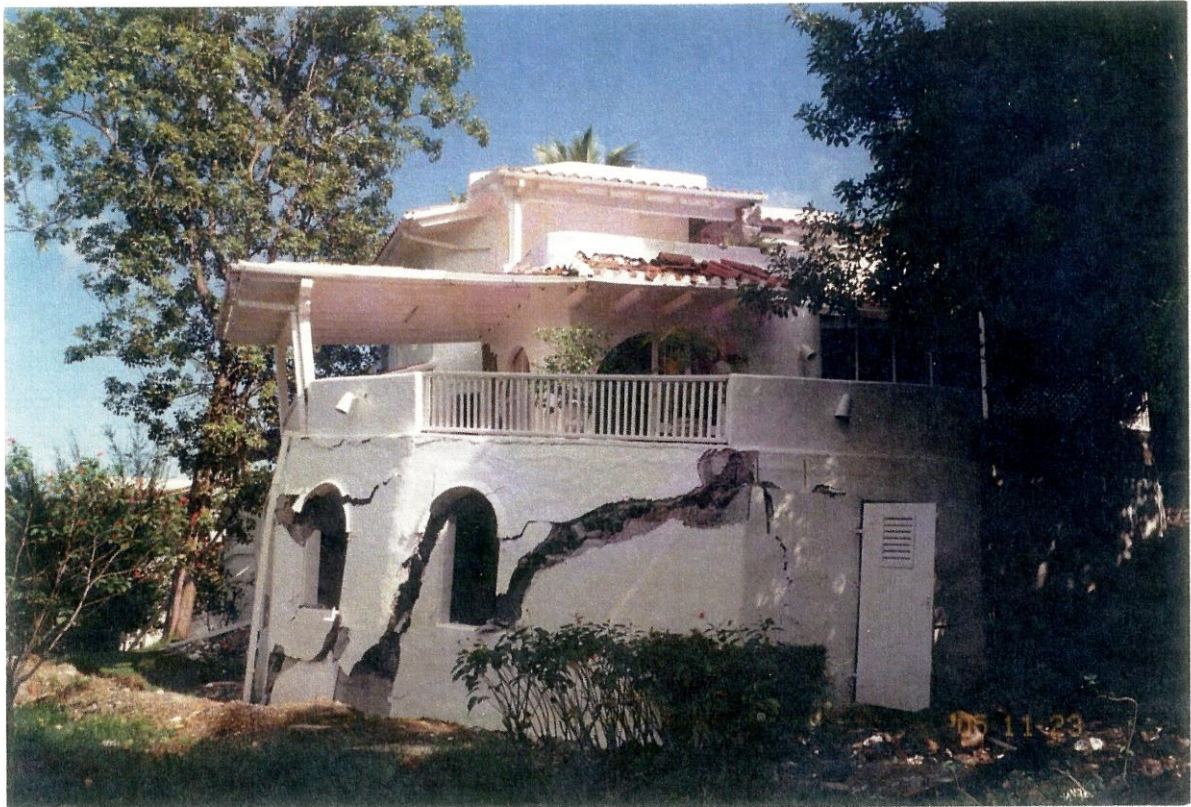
Damaged Villas 17/18 at Windjammer Landing
